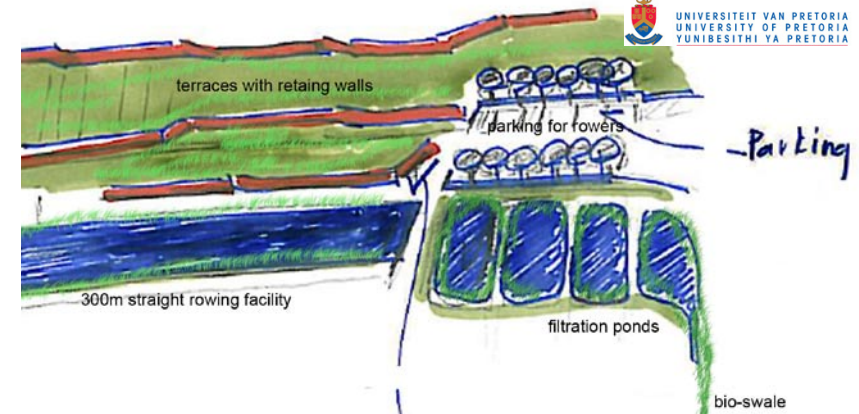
Parking located near access point of rowing facility, Author, 2008
